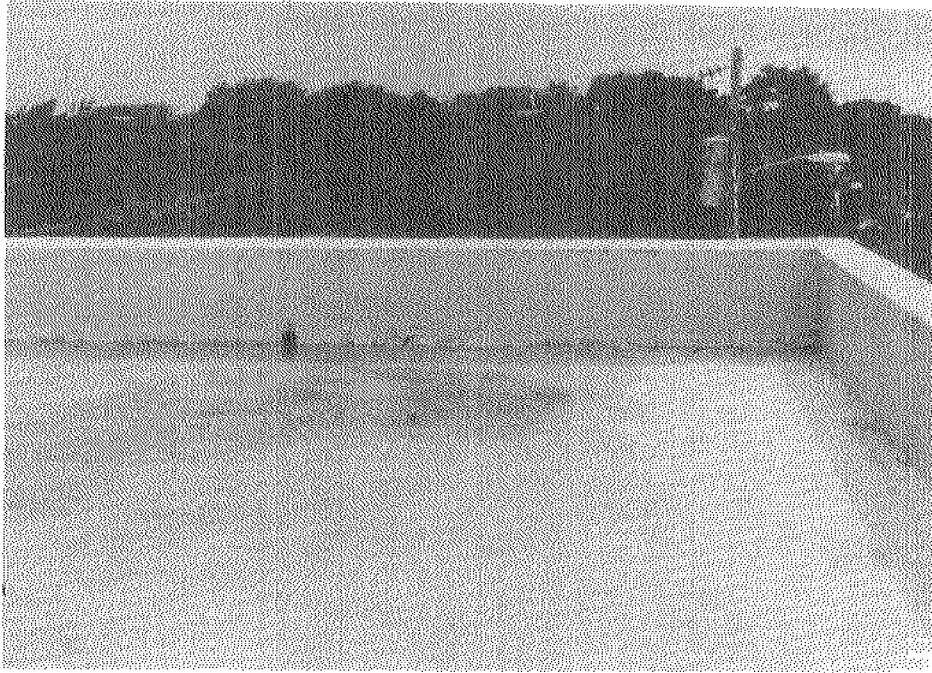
Parapet that Will Trap Water if Scuppers Clog
